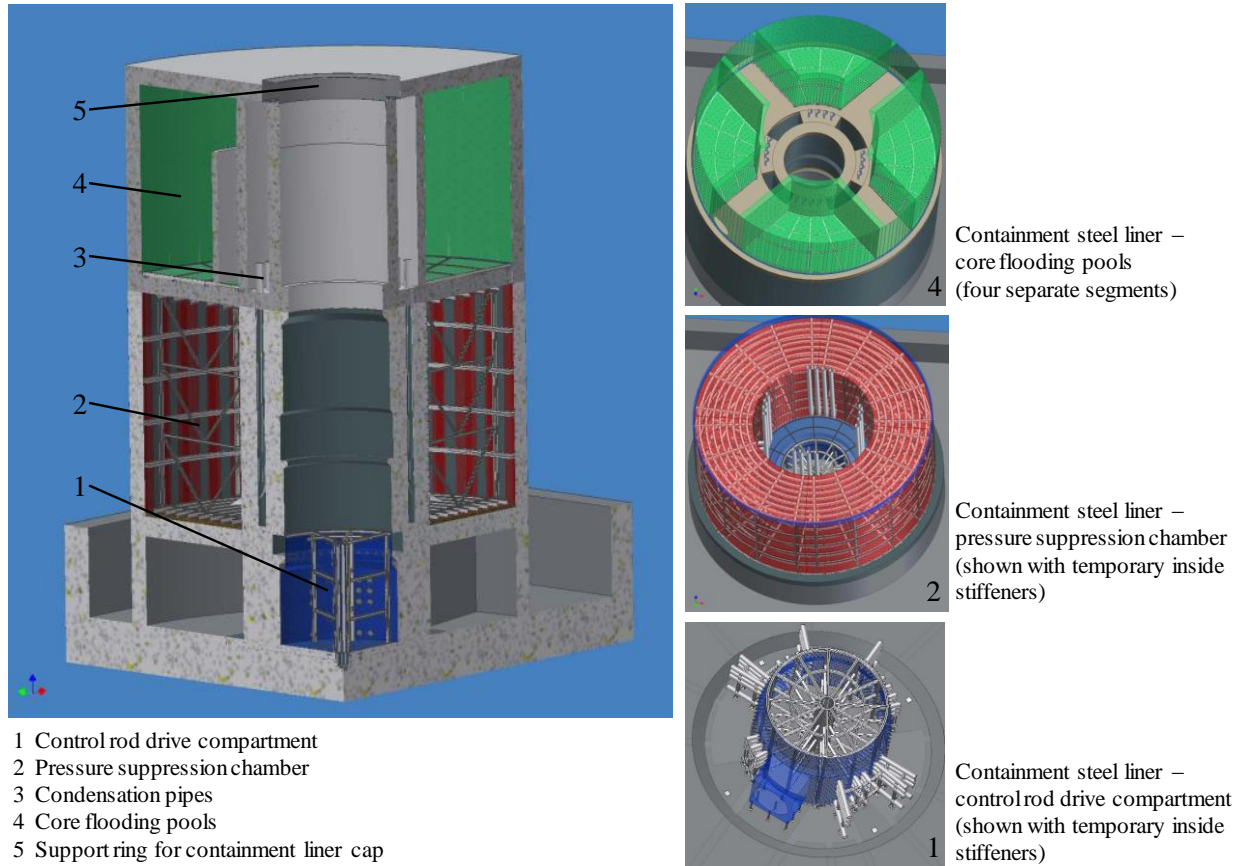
Containment vessel inside view with the largest containment steel liner erection parts
